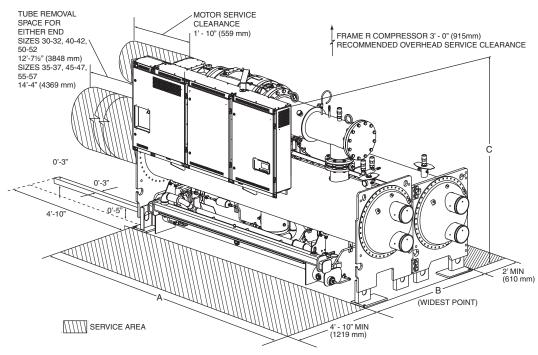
23XRV Heat Exchanger Sizes 30-57 Dimensions (Unit with R Compressor Shown)
